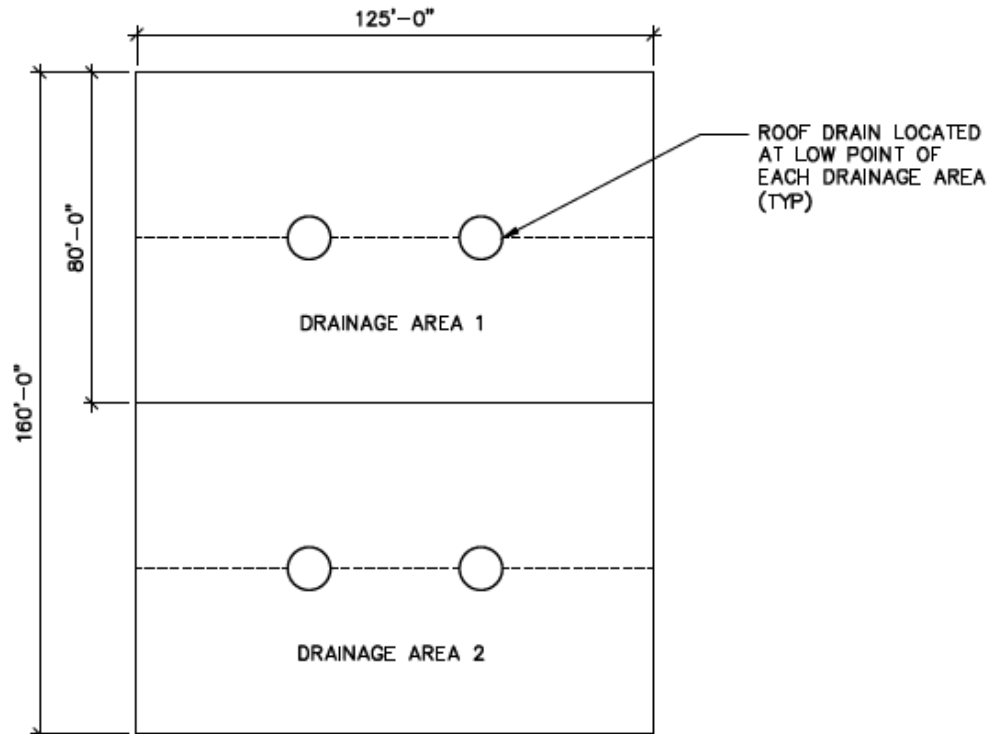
Plan View of Uni-Directionally Sloped Blue Roof
